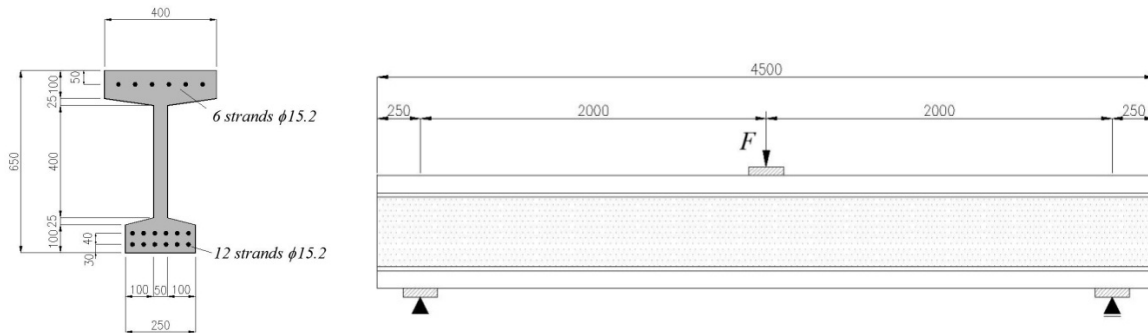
Geometry of the UHPFRC beams and loading configurations [VOO2003b]
